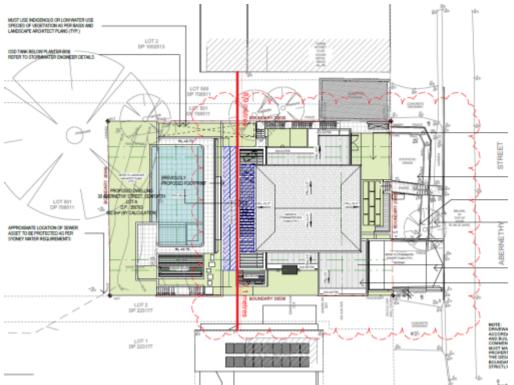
Figure XX - Red line represents alignment of breaching top floor balcony, sitting behind the alignment of the adjoining two buildings.
